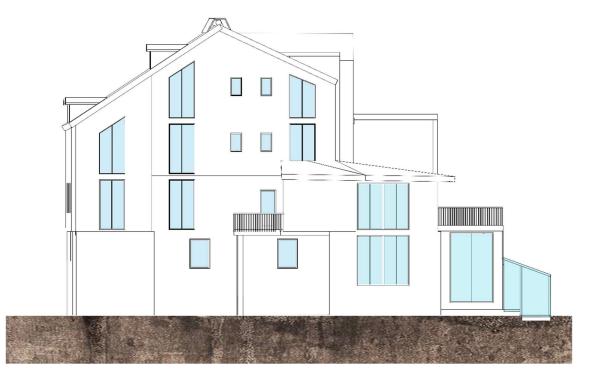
Schematic diagram of the window improvement on the west façade (Source: by Author)
